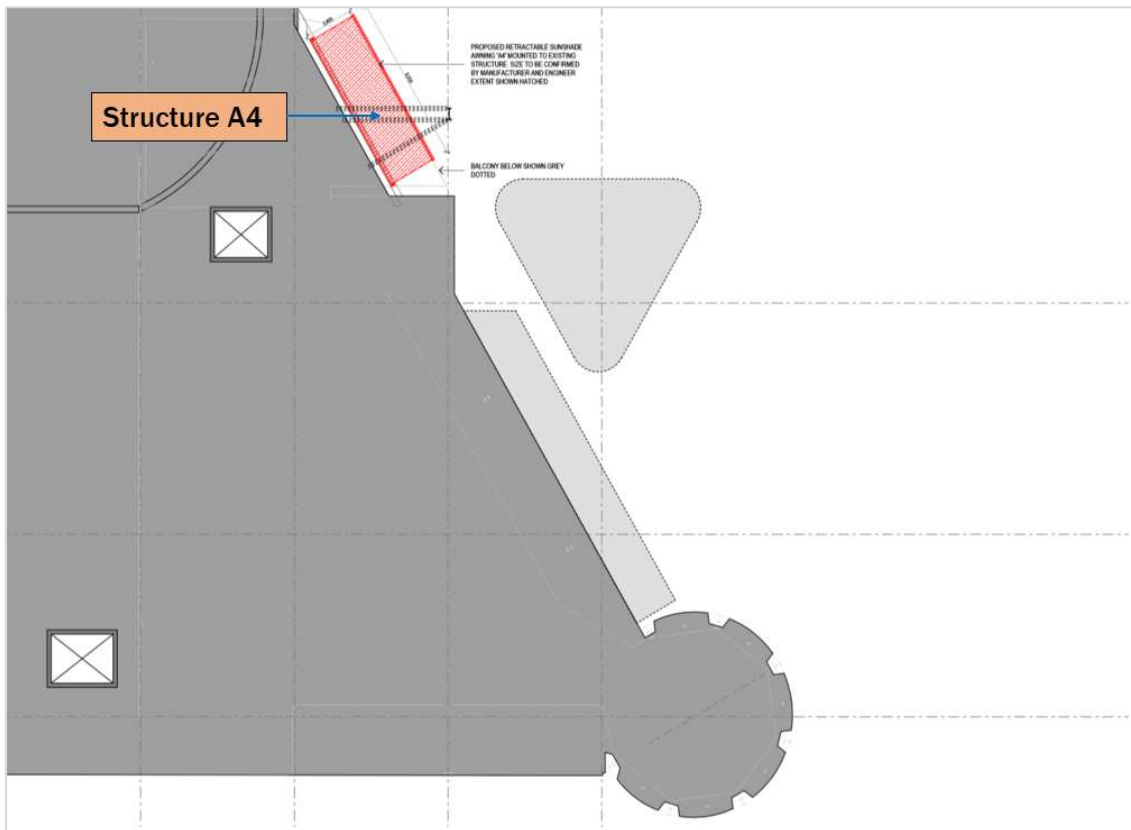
Location of Tenancy 5 OPT building shade structures – first floor (Source: Greenlight Design)
